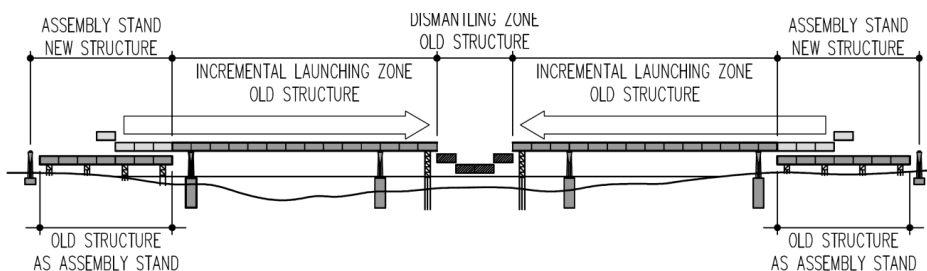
Replacement method of steel part of Łazienkowski Bridge. During the operation additional temporary support in the middle of right part of the structure was added
